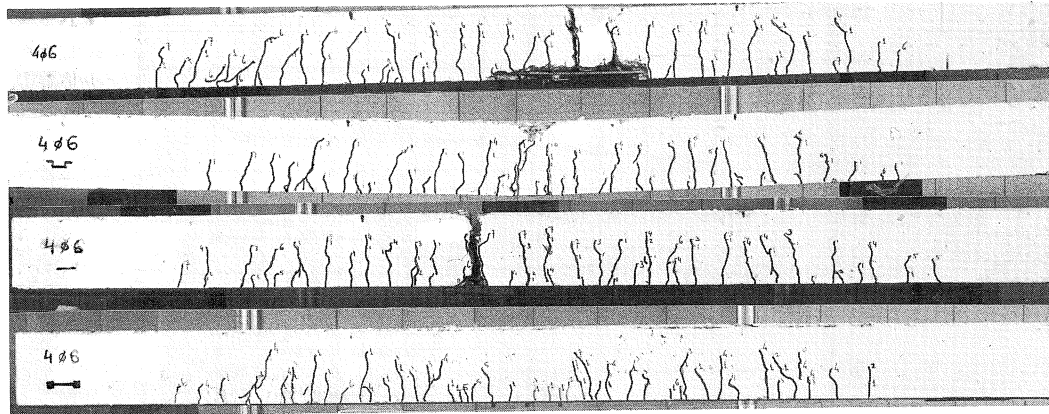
Crack pattern of beams with 4 Ø 6 bars.
